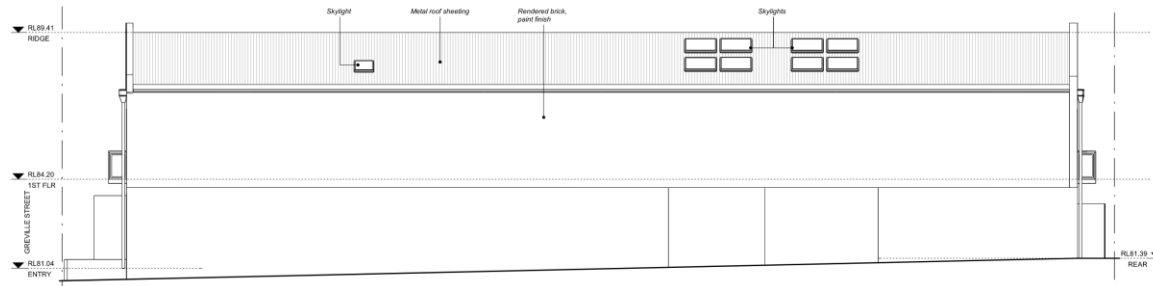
Proposed East (Side) Elevation (Source: HallGroup & Co)
